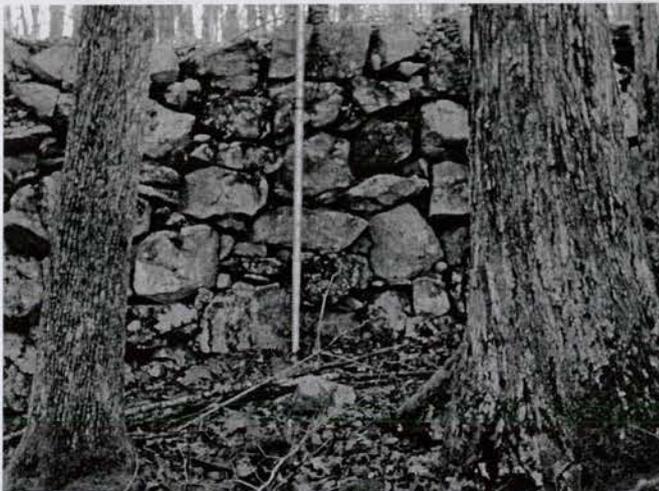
36-12-1-2005 London Bridge W wall, North to South, Section 6C View E
